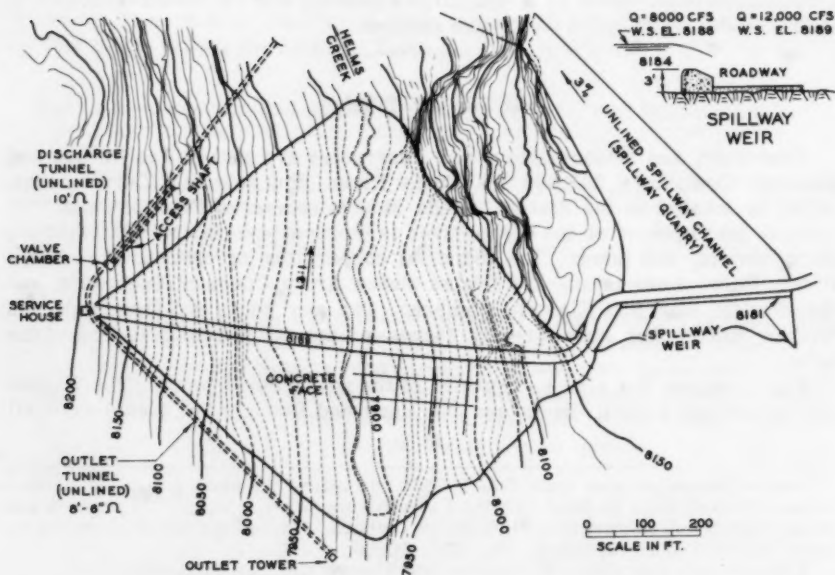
PLAN OF COURTRIGHT DAM AND OUTLET WORKS
